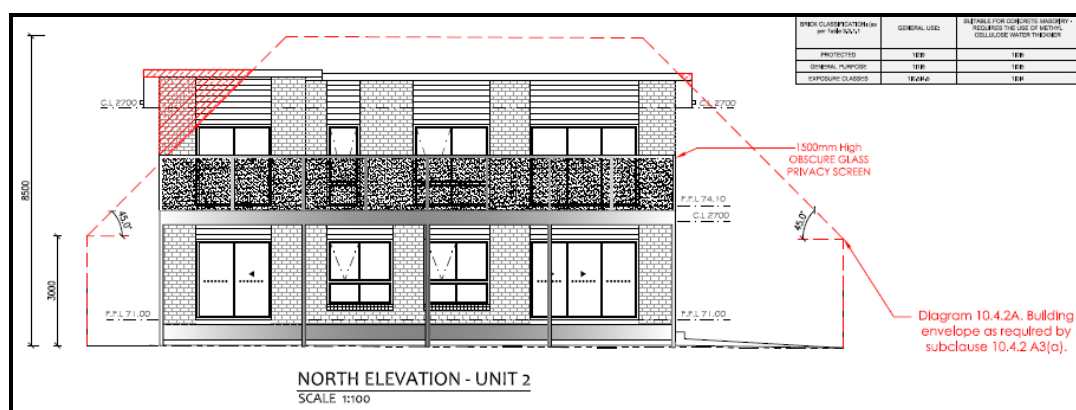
A view of the north-eastern (north) elevation of proposed dwelling 2, showing the decks along extending along the ground and first floors.
